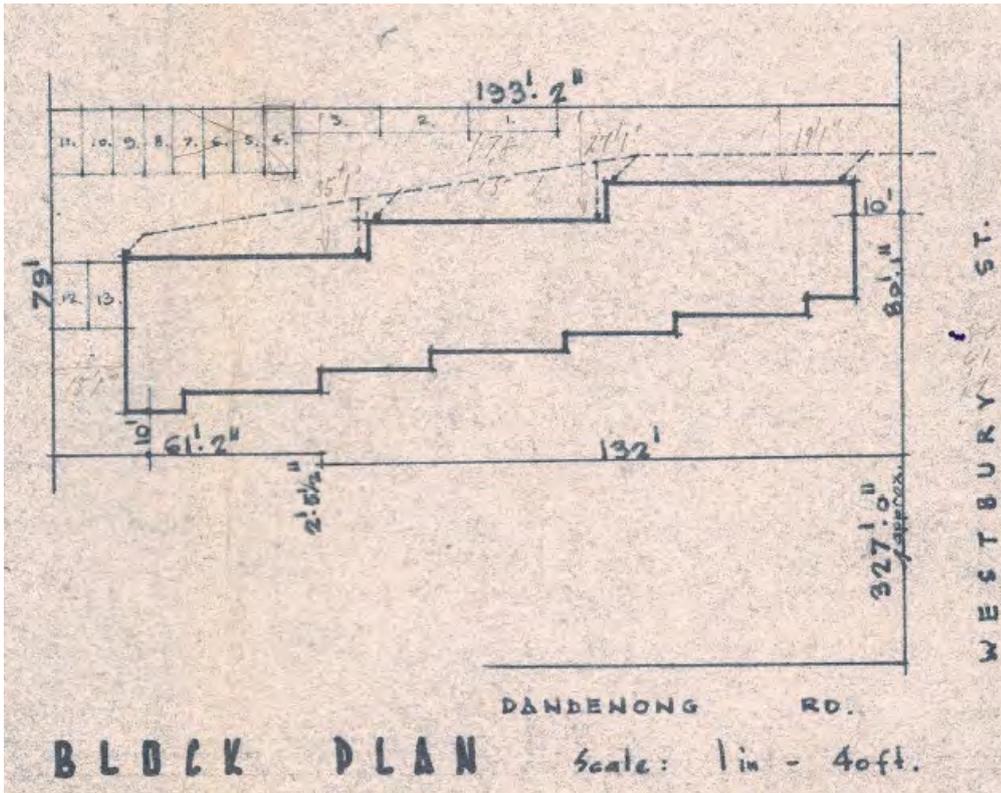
1960 drawings, Block Plan showing building footprint (Source: Building File)
